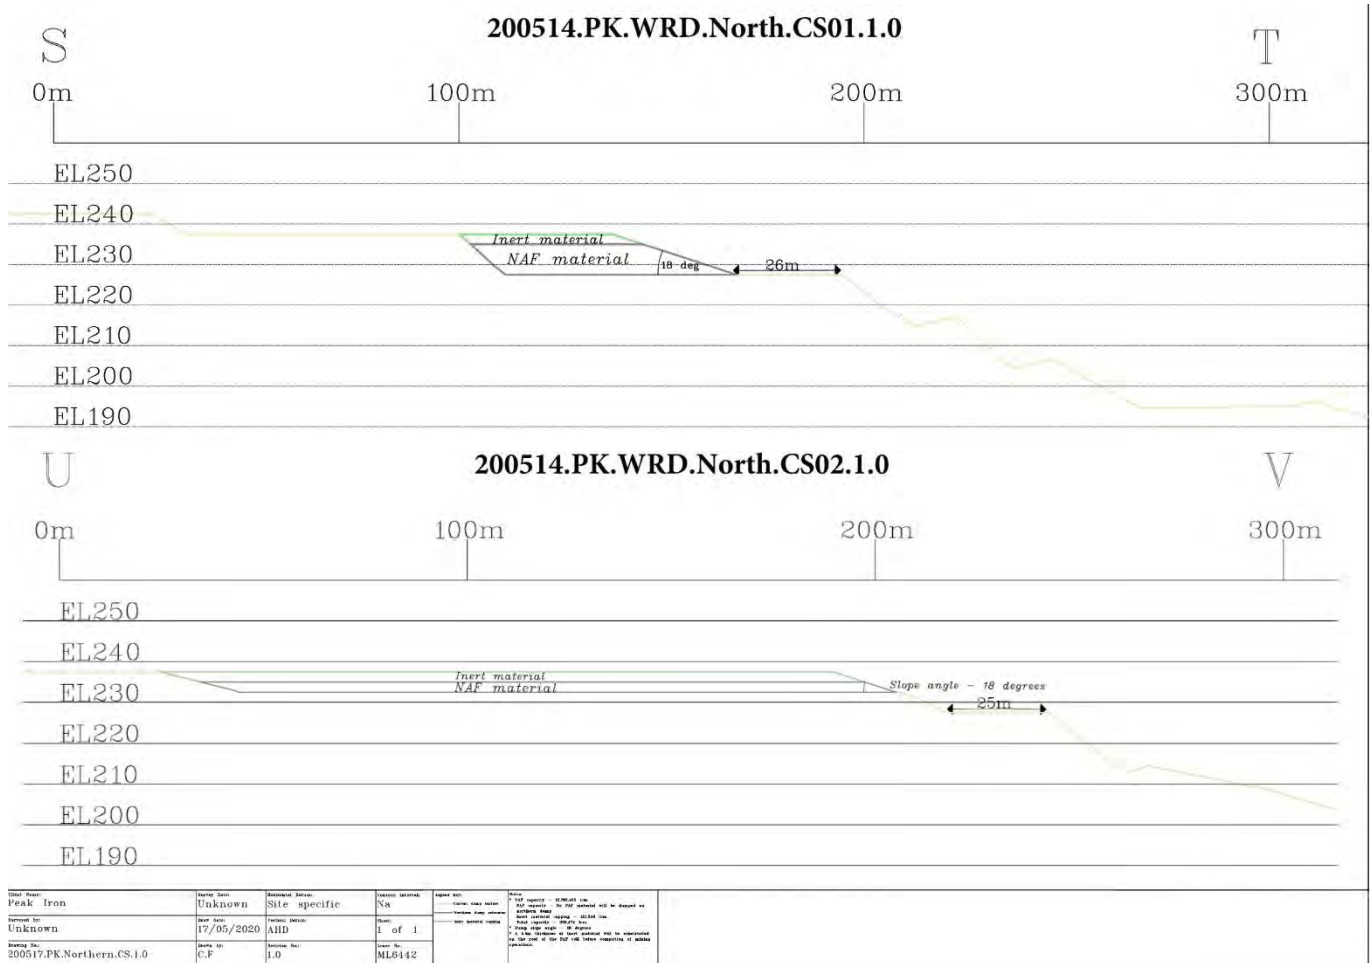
Northern WRD extension – cross sections S – T and U – V
